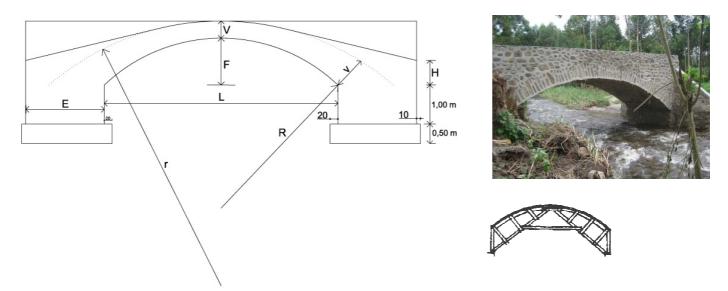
Diagram, formwork and example of a segmental arch bridge.
